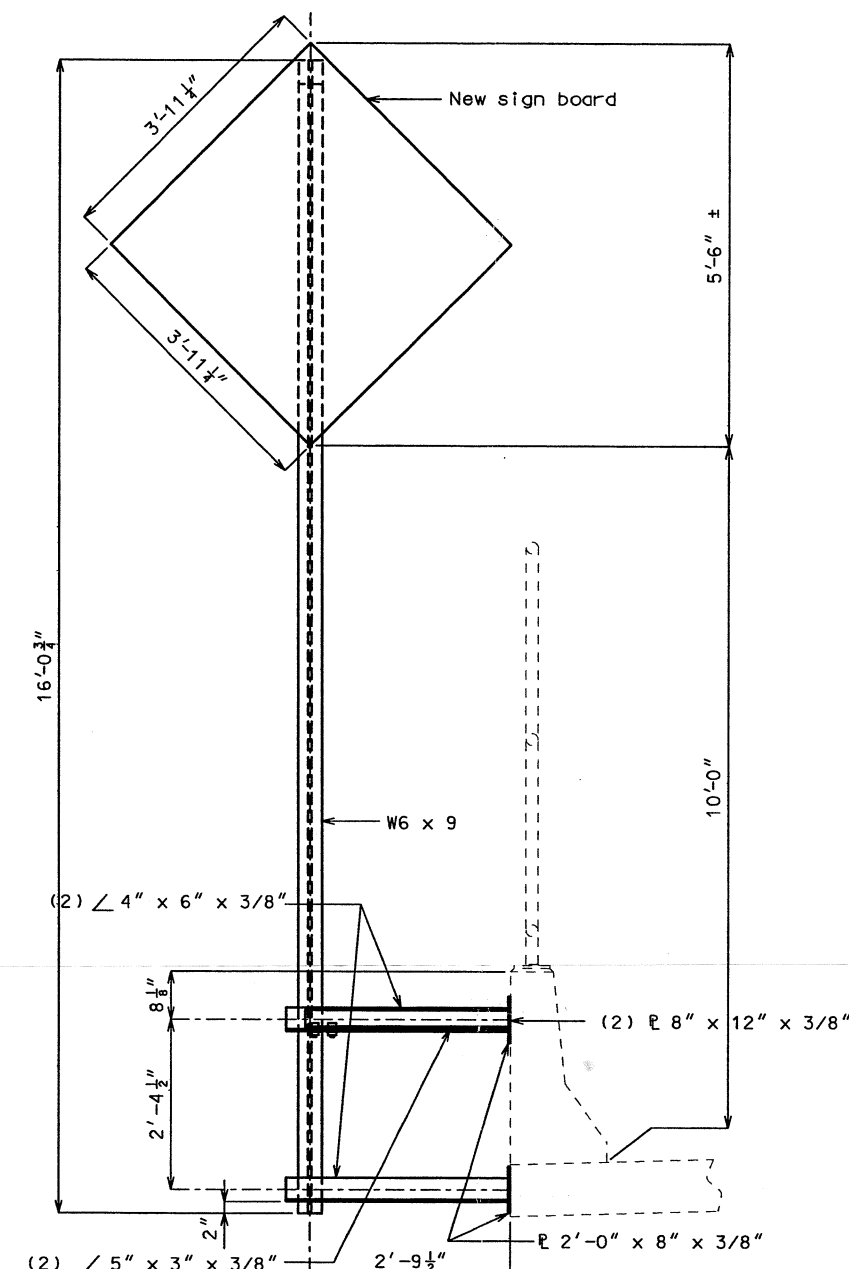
DETAILS OF MODIFICATIONS TO EXISTING SIGN SUPPORT BRACKET
